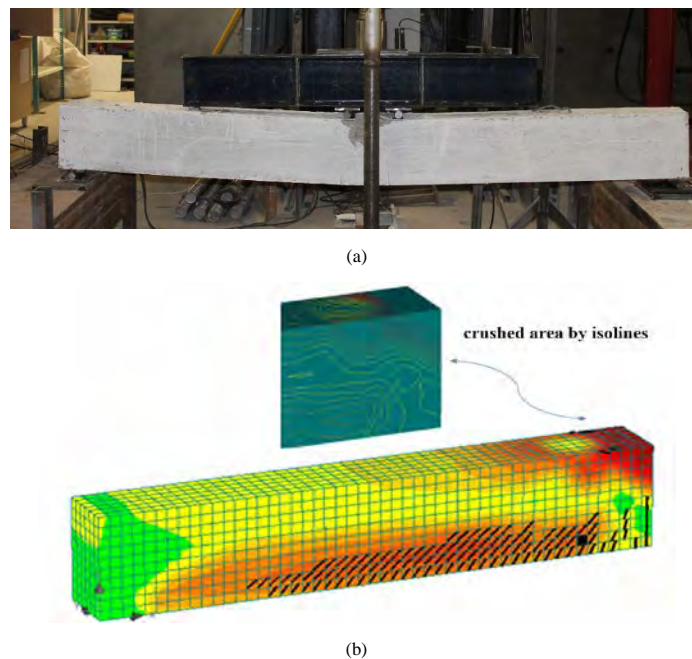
(a) Concrete crushing in the over-reinforced beam (b) numerical prediction at failure
